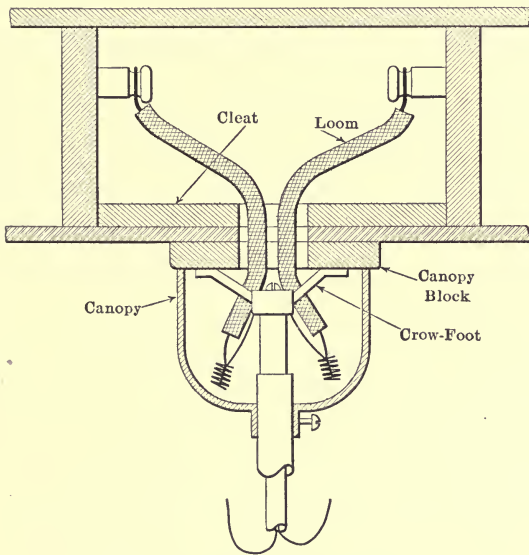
ELECTRIC FIXTURE SUPPORT.
